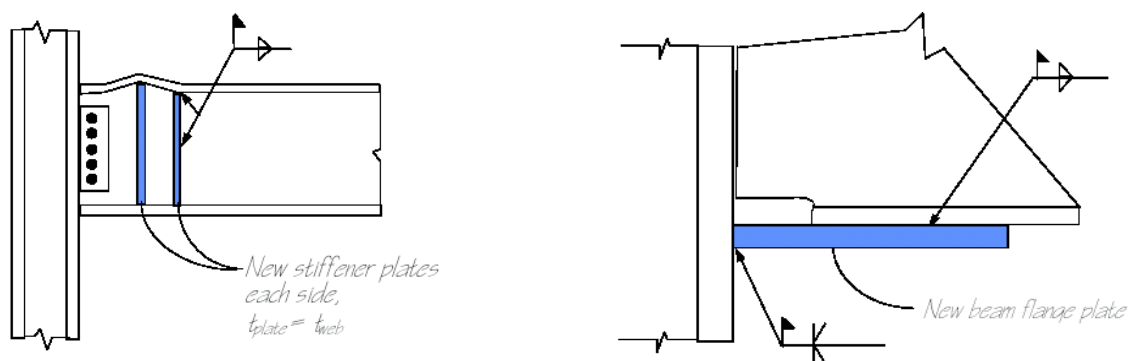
Typical repairs for buckled (left) and fractured (right) flanges of steel beams (after FEMA 351, 2000).
